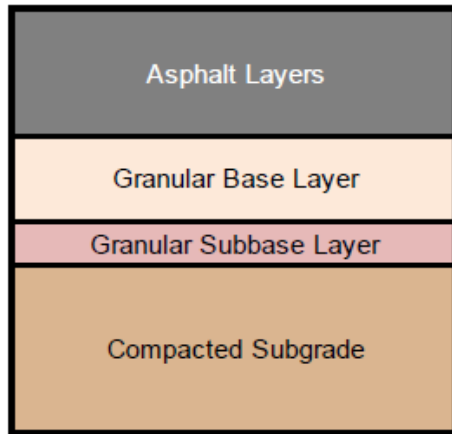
Conventional asphalt pavement (Not to scale) (T. J. Van Dam et al., 2015, Figure 4.3)
